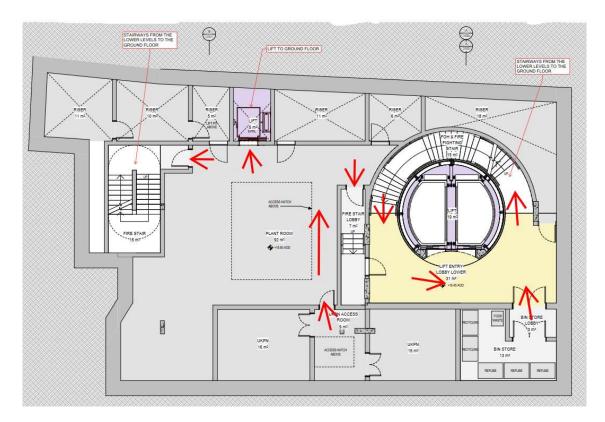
Furnival Street - Level B1 Evacuation Route Plan
